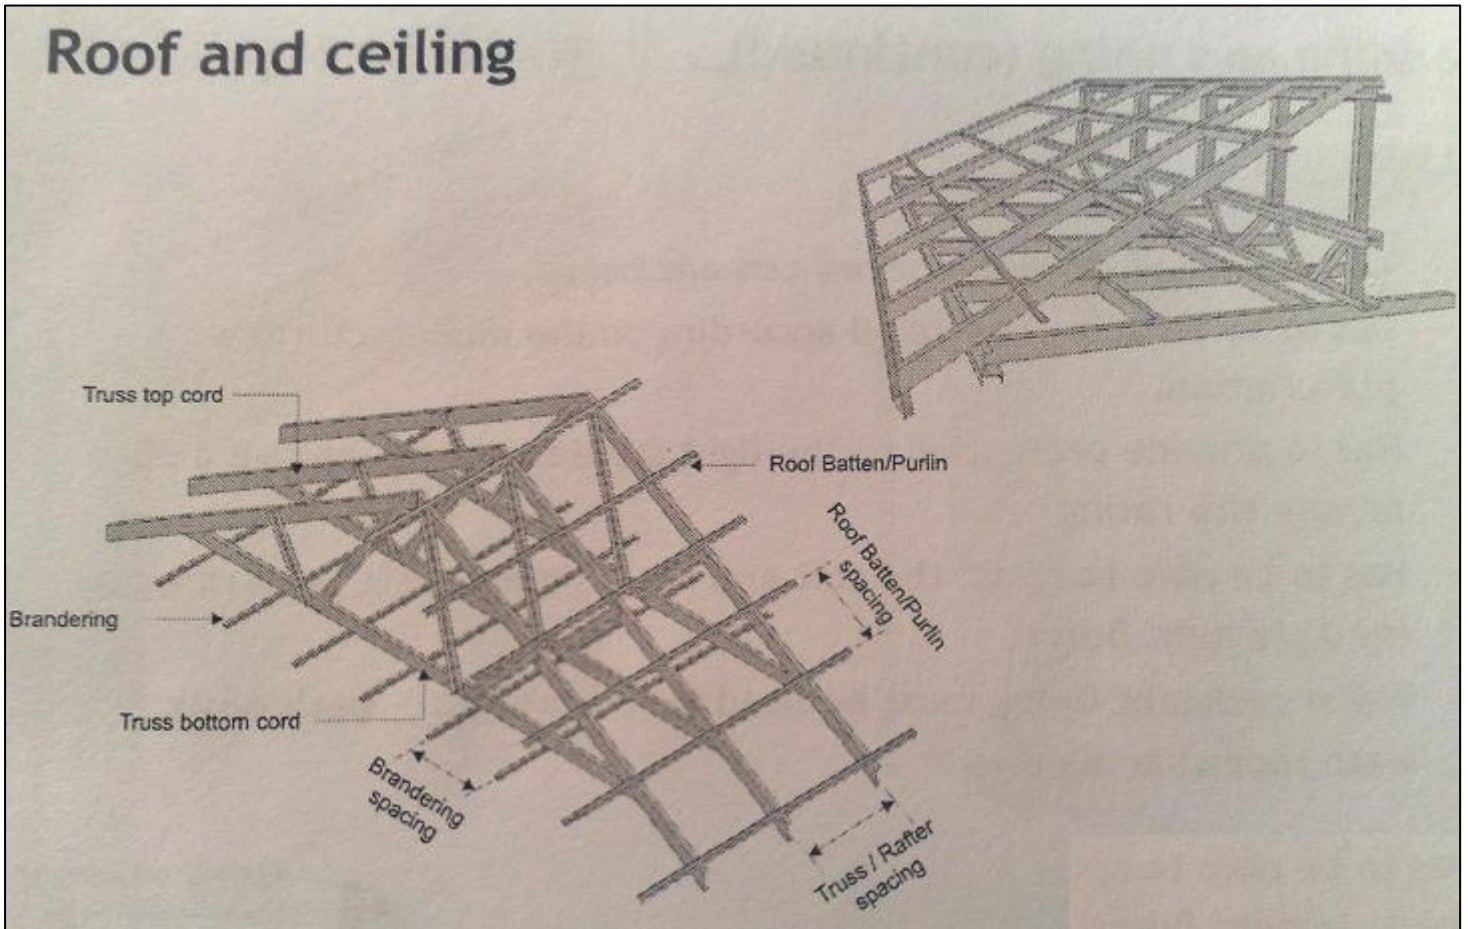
Roof and ceiling (SASFA Course 2008:21)
